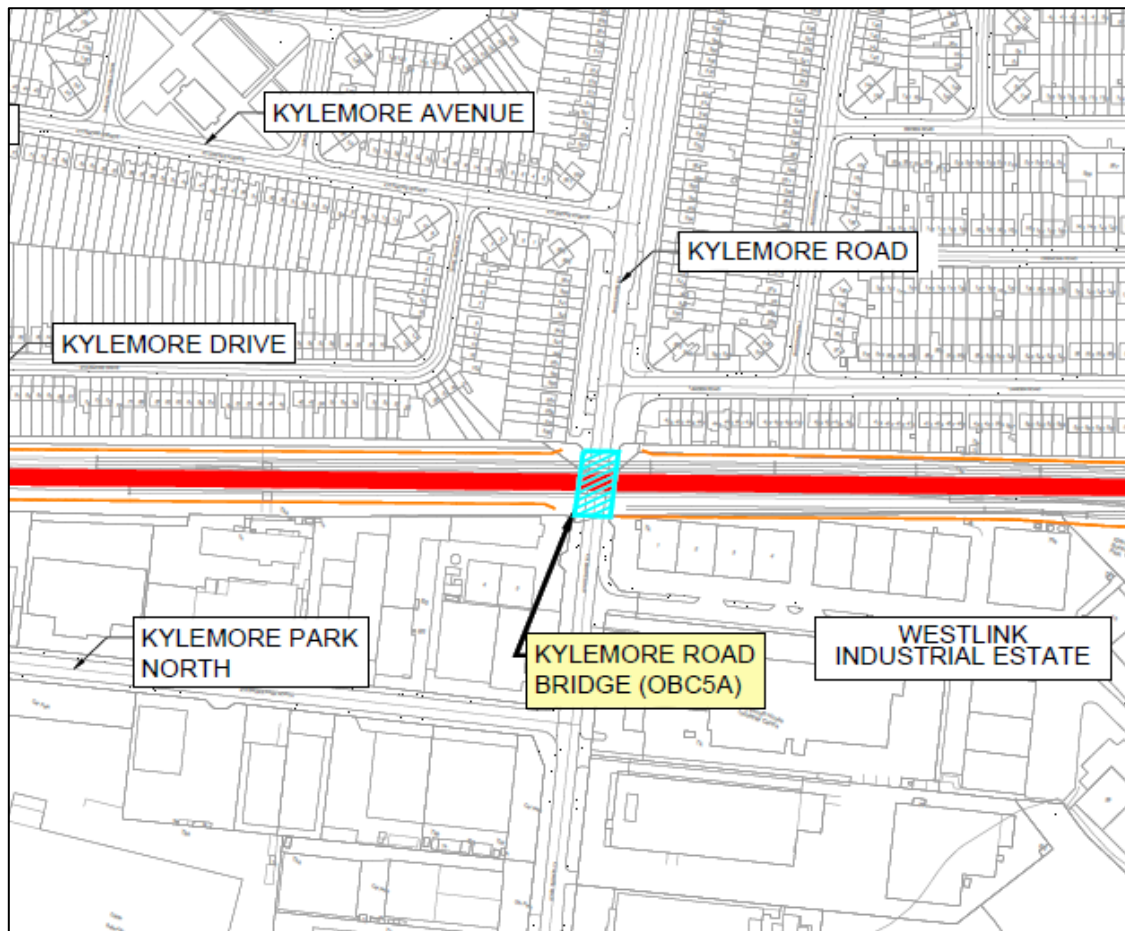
Emerging Preferred Option around Kylemore Road Bridge
